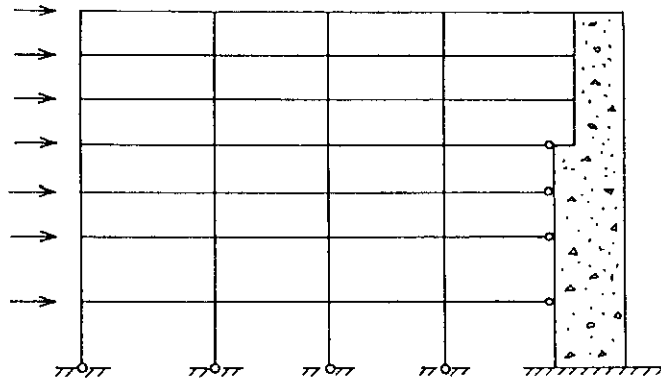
Lateral support for simply constructed steel frame from concrete core.
